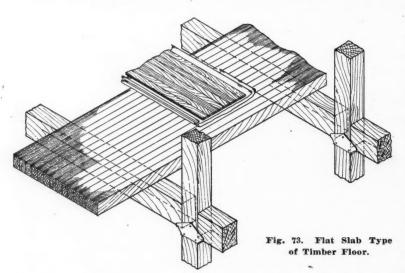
This floor is supported by the main girders as in the previous case, but is intended for use with long spans or heavy floor loads. The floor may be made up by laying on edge planks 2 inches or 3 inches thick and from 6 inches to 8 inches wide. Each plank is securely spiked to its neighbor when it is laid and helps to build up a solid timber floor slab. The edges of the planks are surfaced and given a slight bevel
